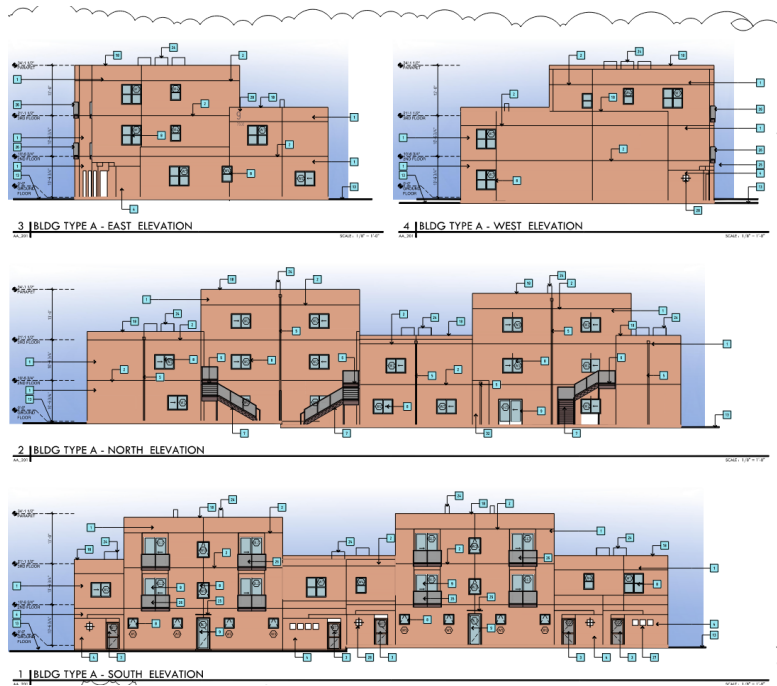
Drawing of the new proposed exterior of one building type on the property. See full plan sets in Attachment C.
